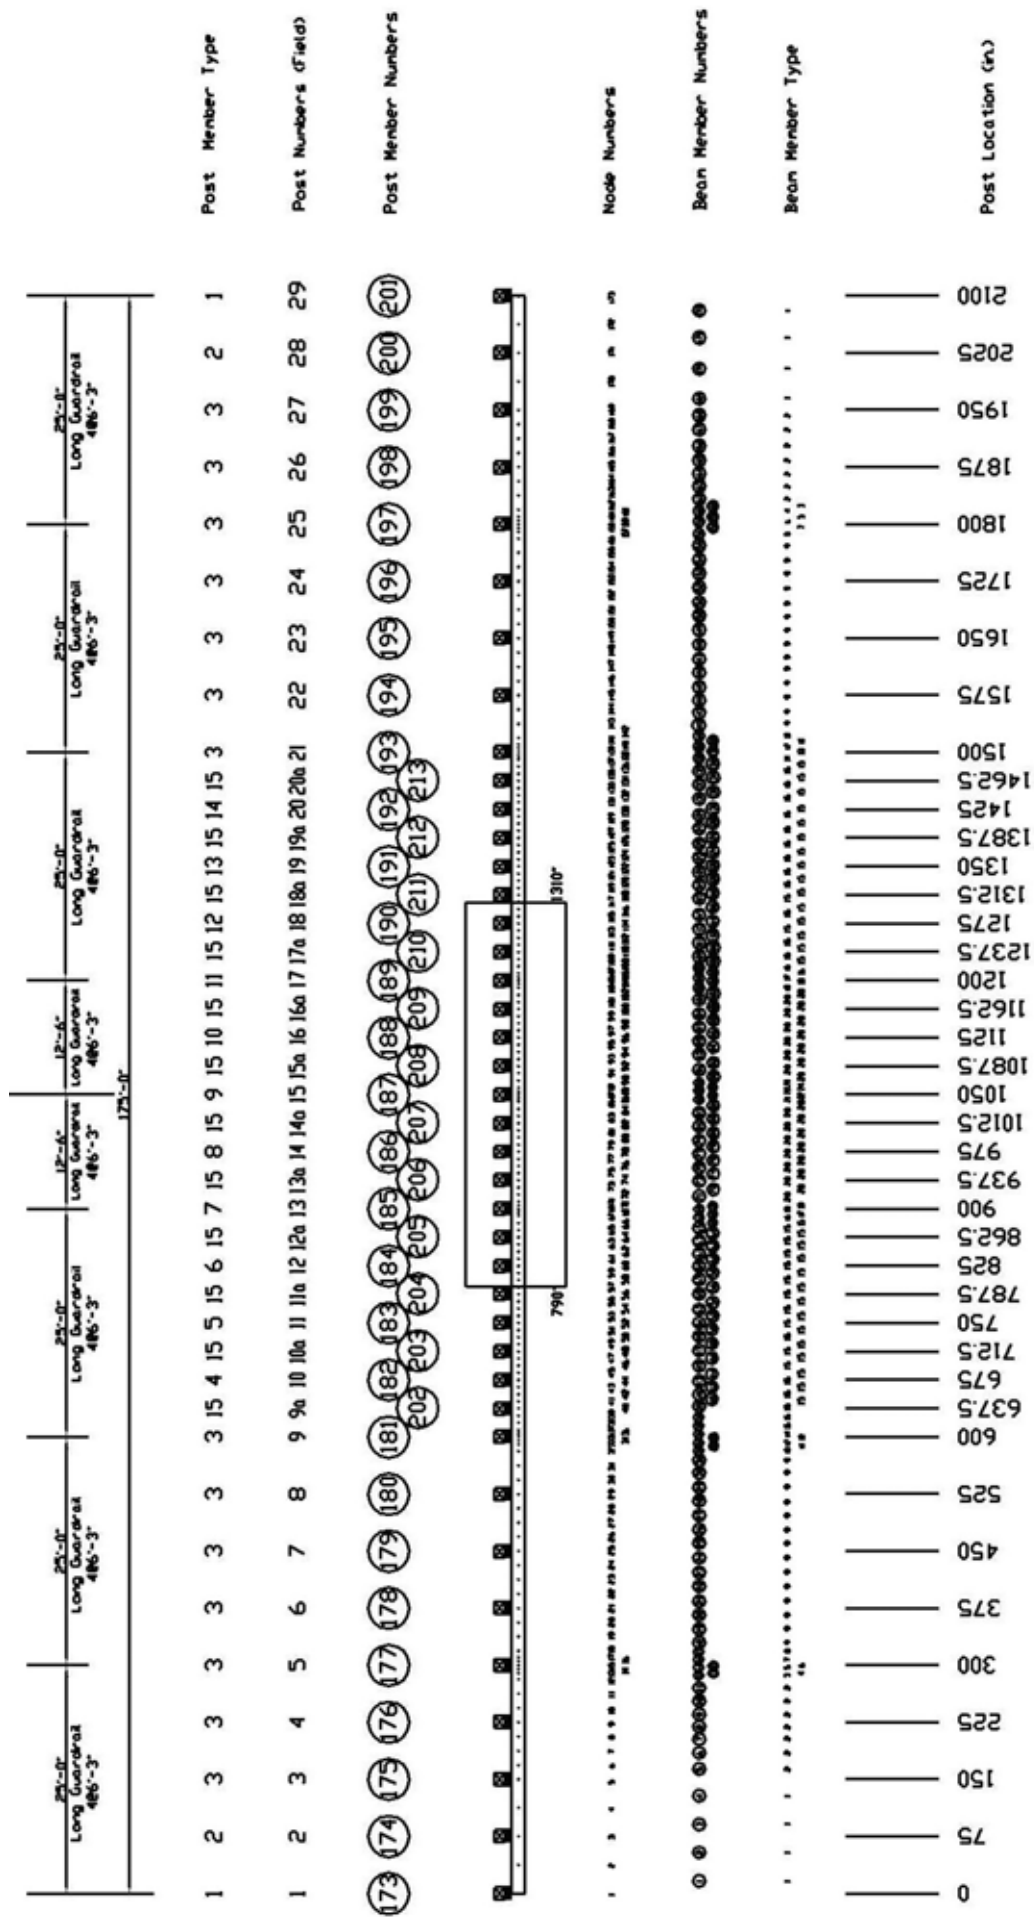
Model of the Post-to-Culvert Guardrail System, Half-Post Spacing
